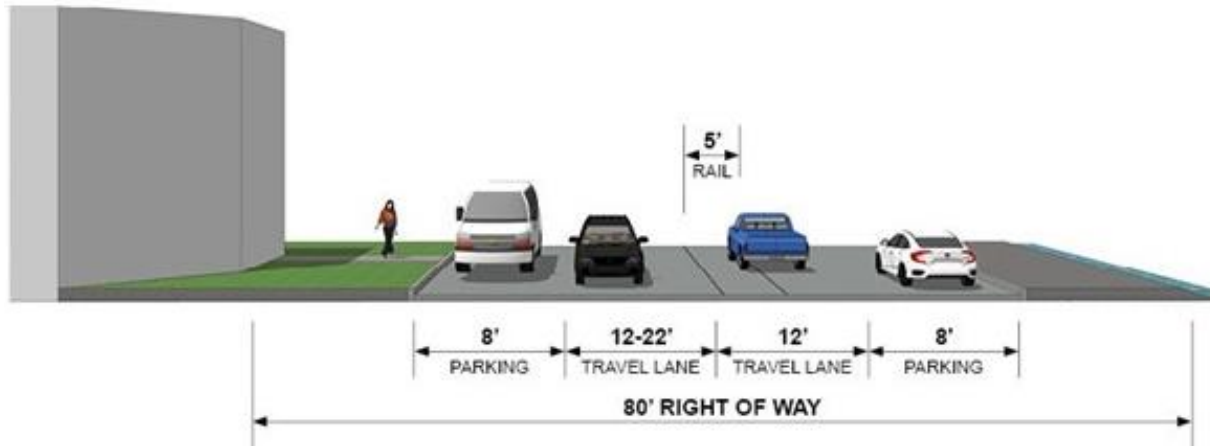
Existing Section A (Typical) - Front Street north of Date Ave.
